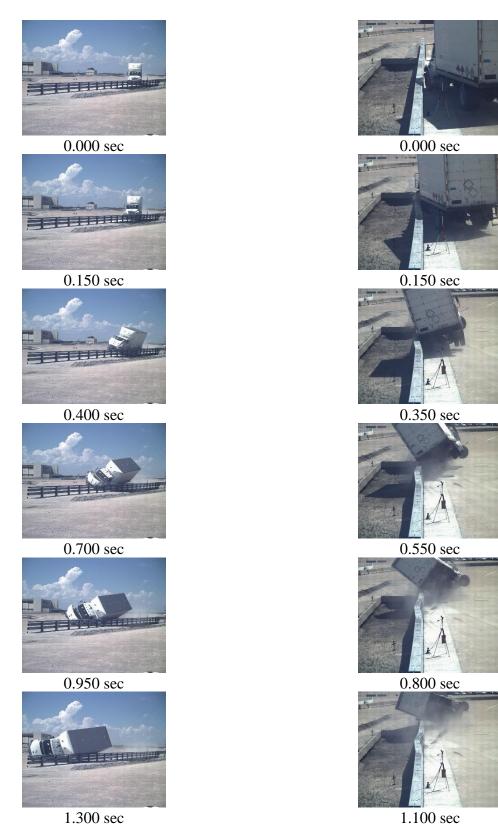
Additional Sequential Photographs, Test No. STBR-4
